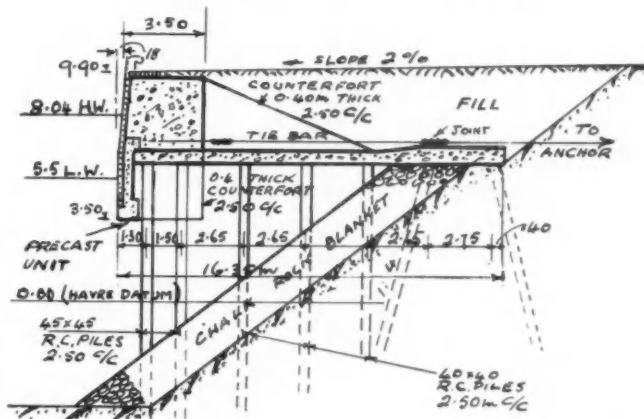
Rouen. Cross-section of Modern "Rouen Type" Reinforced Concrete Quay. All construction done above water level in dry.
